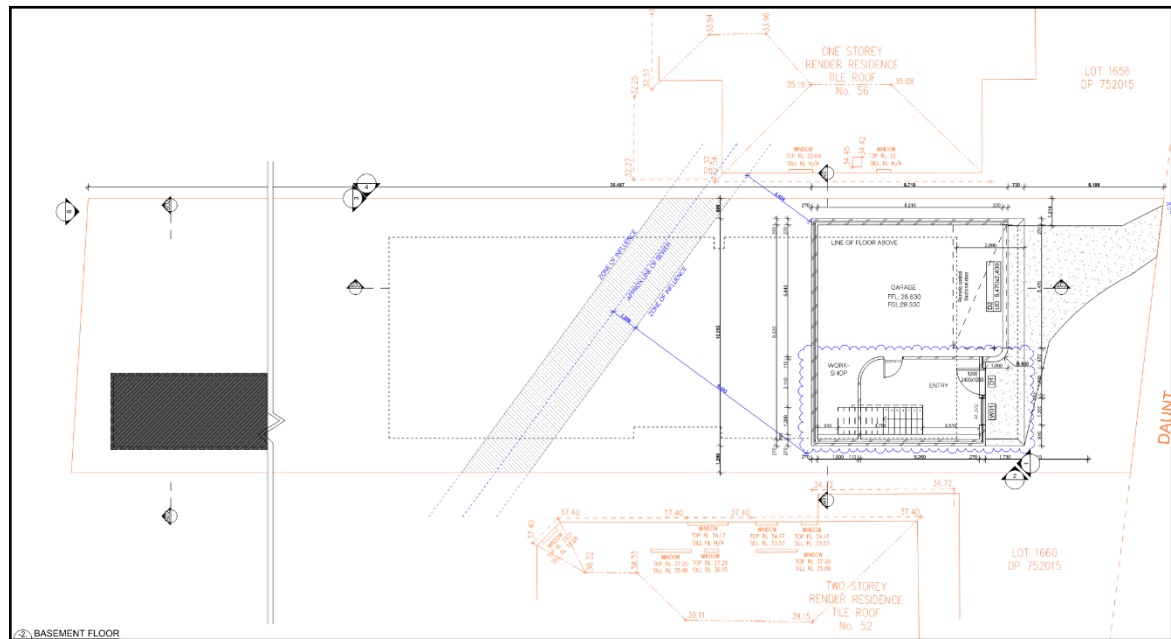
Garage and Ground Floor Plan - 54 Daunt Avenue (Source: Prime Design Studios)
